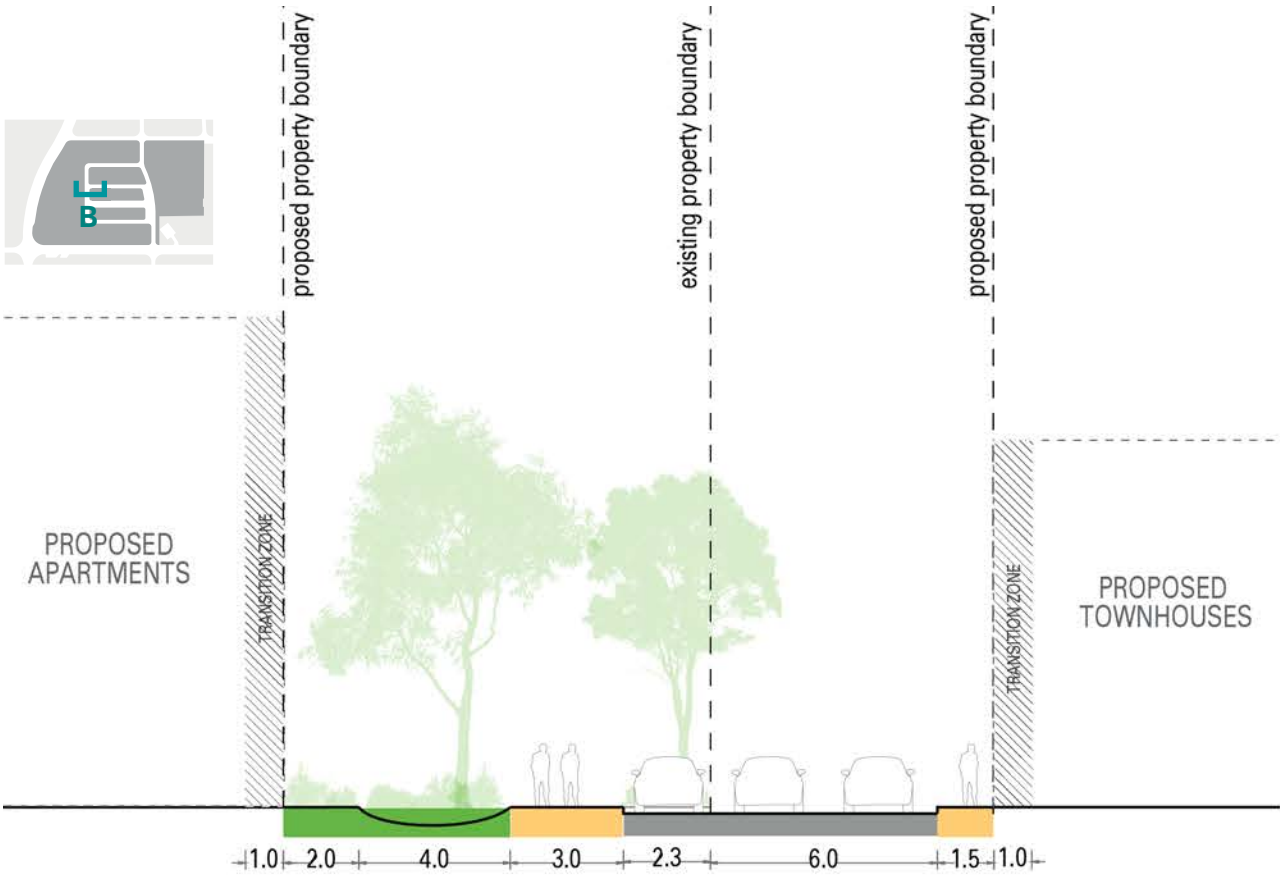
Section B: Precinct Street (North-South) (1:200@A3)
